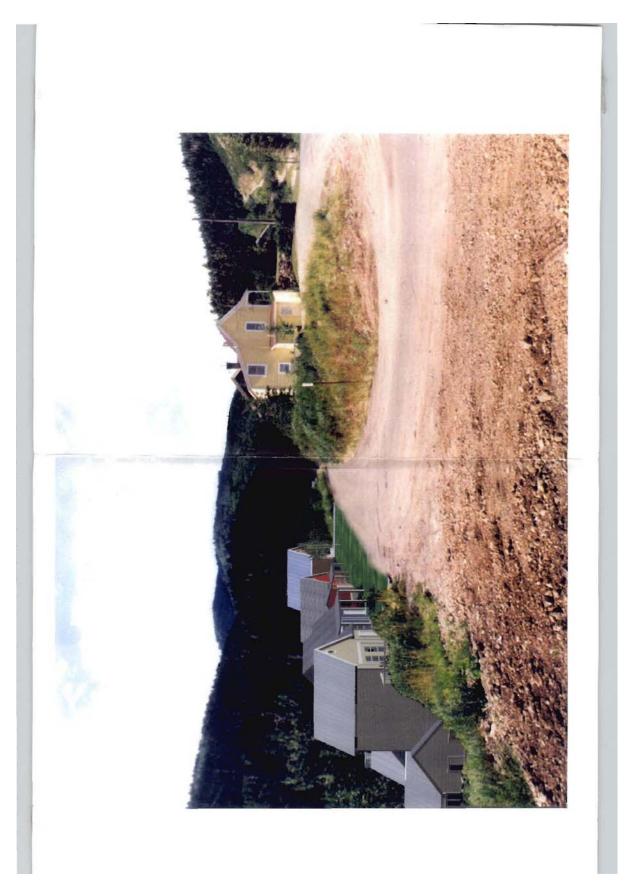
Exhibit F continued – Previous Ridge Avenue Plan (circa 1997)
